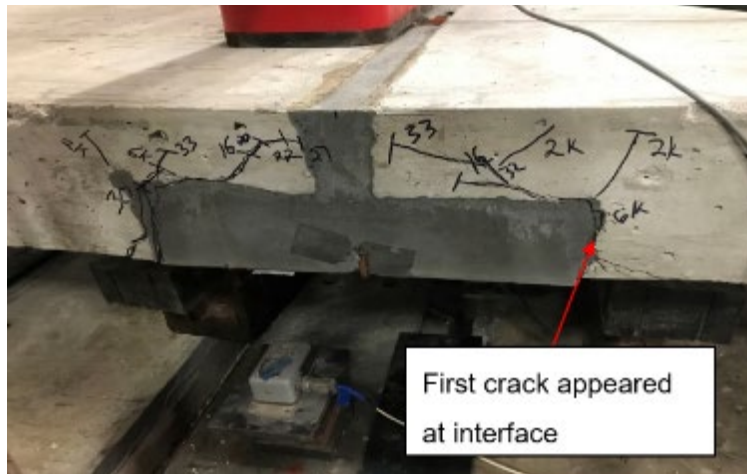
Cracks propagating from the bottom of the slab to the top at failure on the north side of J3 slab joint 1
